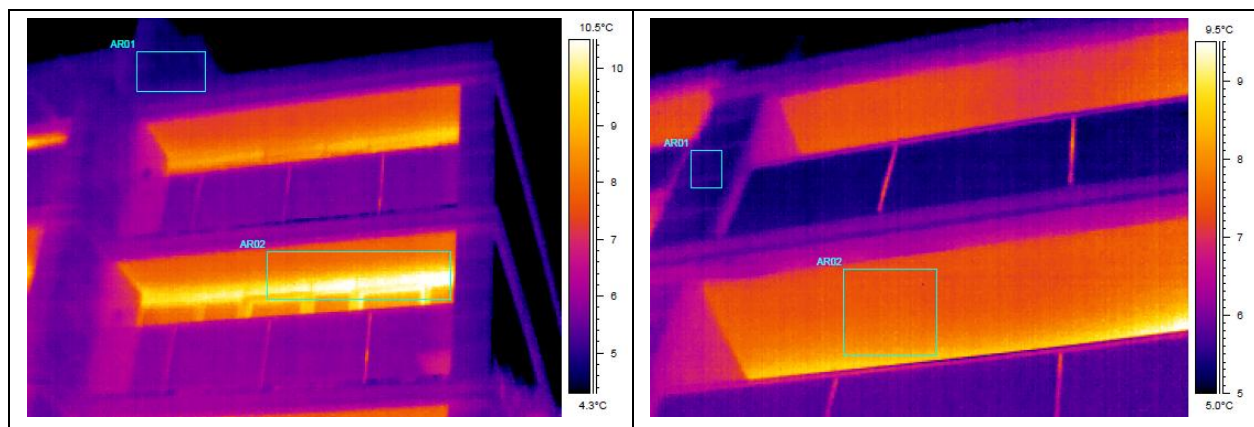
Thermography image showing heat loss (AR02) on the underside of the flat balcony floor slab of Norfolk House potentially by thermal bridging due to structural steel penetration at the façade.
